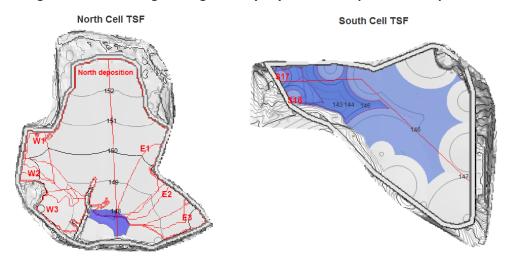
Tailings Storage Facility Layout after Deposition Completed
